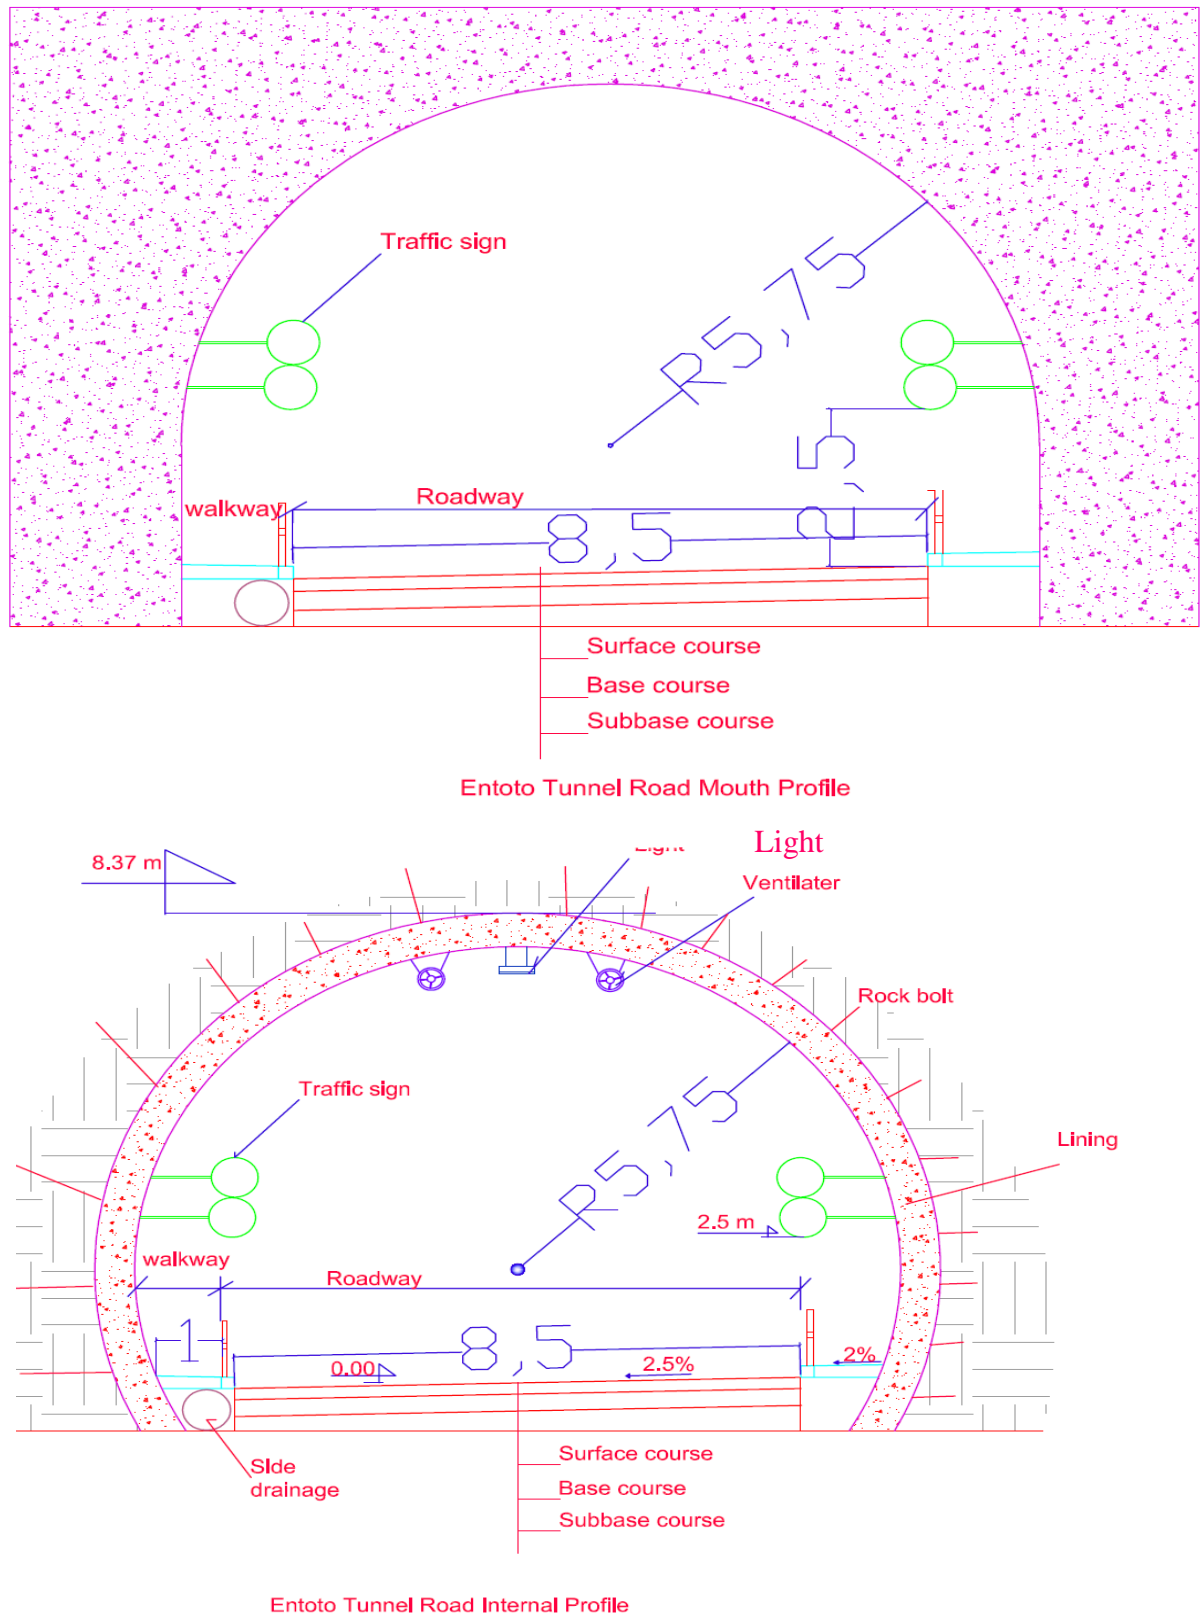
11 Typical Cross-section of Entoto Tunnel Road at portal and internal section
